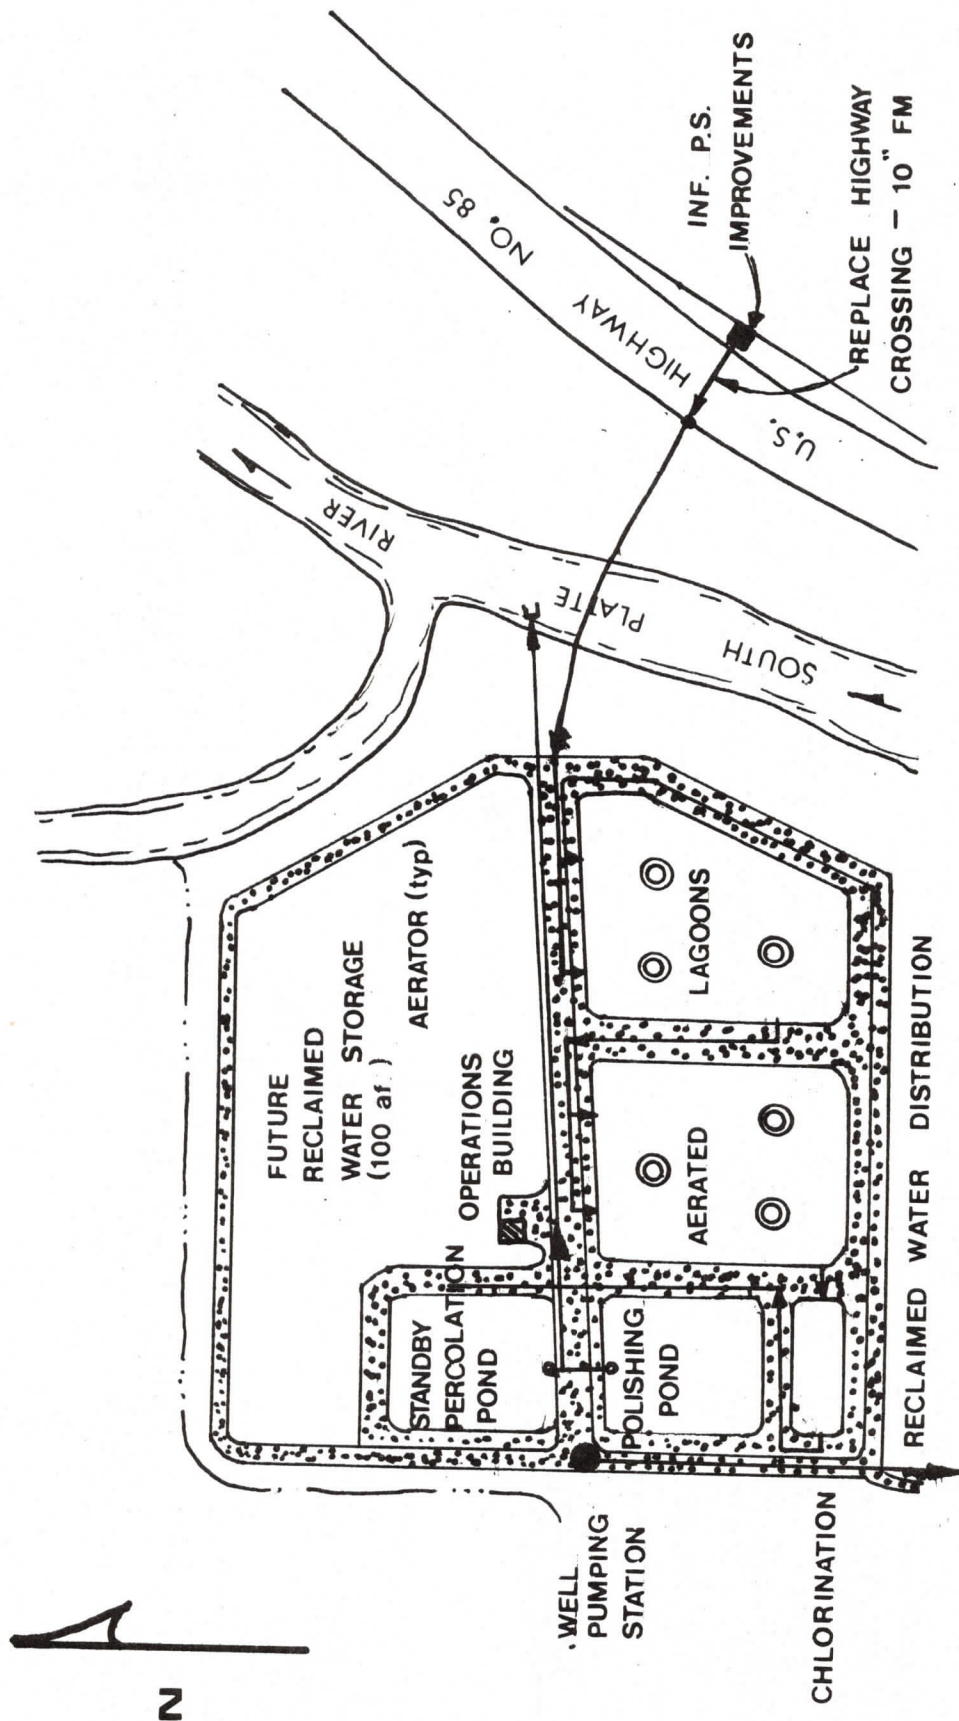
A - PROPOSED WASTEWATER TREATMENT FACILITIES -
